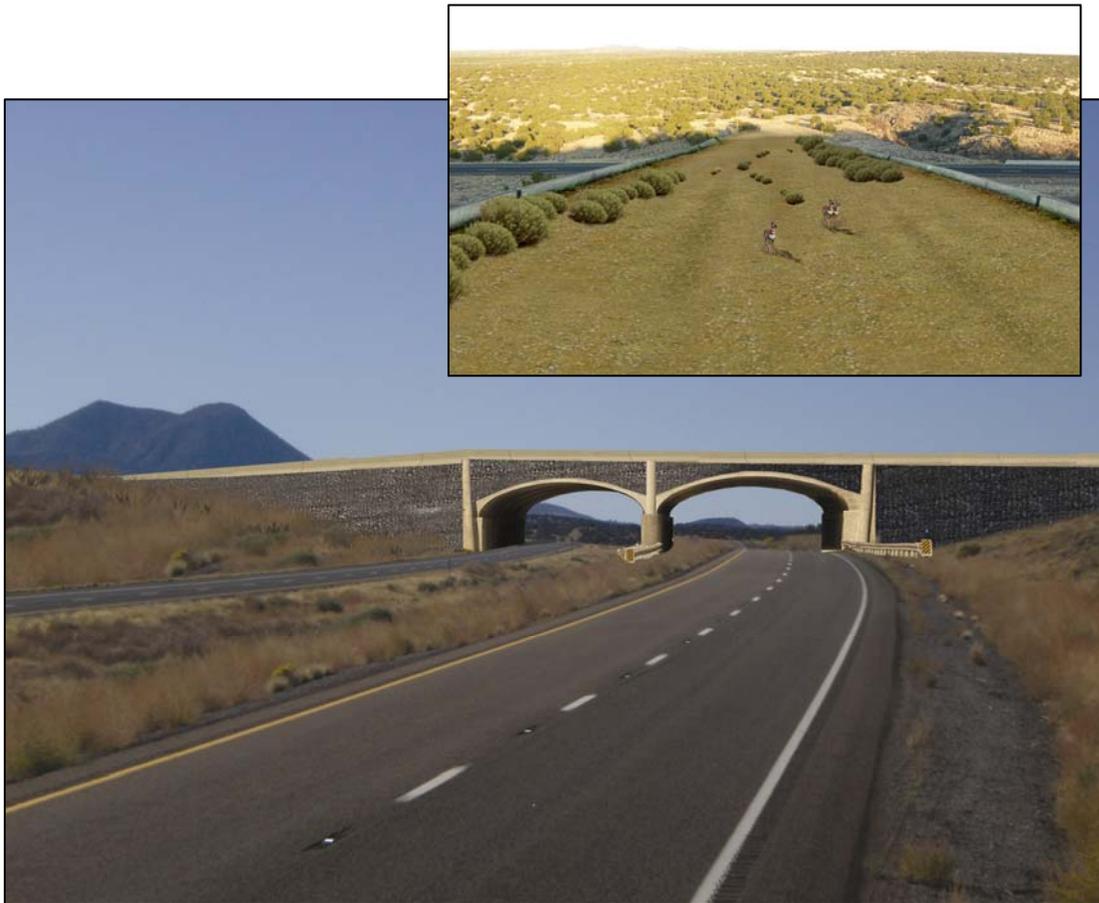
Rendering of a CON/SPAN[®] pre-cast concrete arch application for a wildlife overpass at MP 440.9 along US 89. The bottom rendering depicts separate 32-ft spans (21 ft high) over each set of lanes, looking south, and the inset depicts the top of the overpass, looking east (note: fencing would need to be erected atop the walls).
